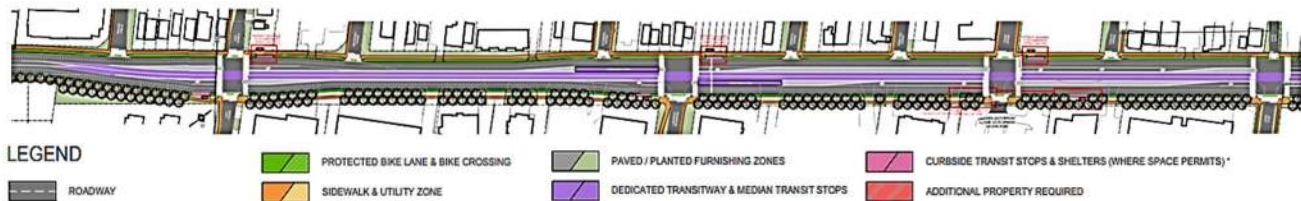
LAKESHORE ROAD EAST – ROLL PLAN EXCERPT (LAKESHORE CONNECTING COMMUNITIES TRANSPORTATION MASTER PLAN: CITY OF MISSISSAUGA / HDR)
